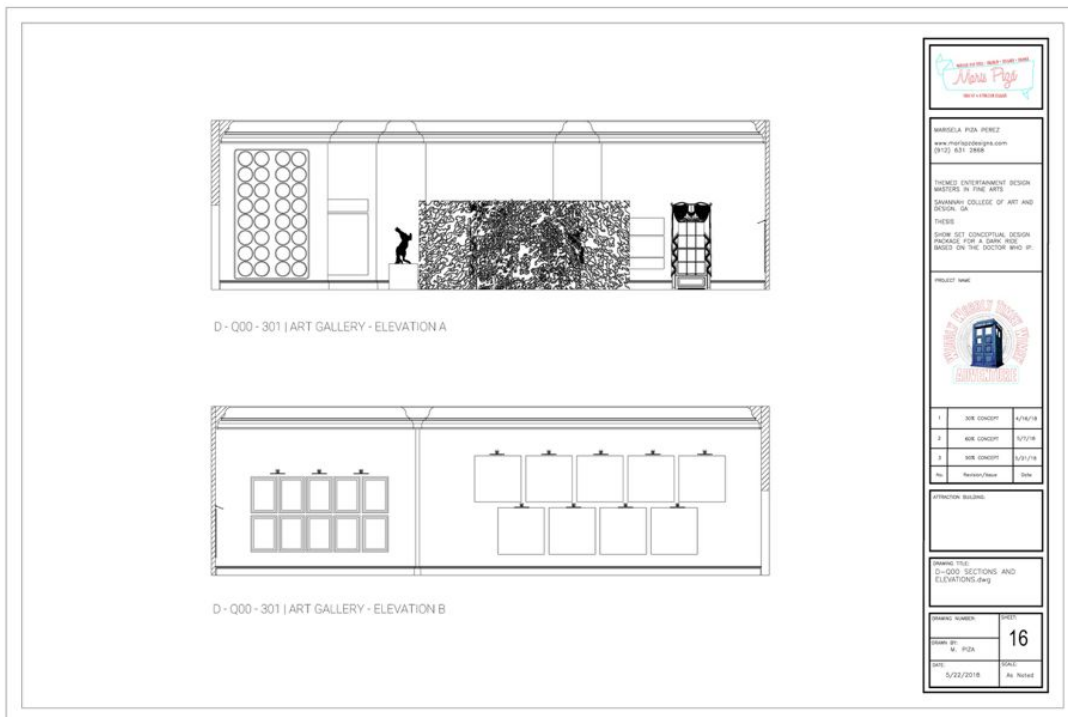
D-Q00-301 | Art Gallery - Sections and Elevations
